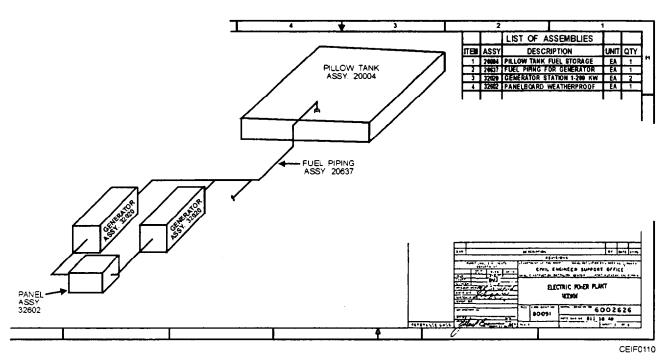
Layout drawing for a 400-kilowatt electrical power plant.
